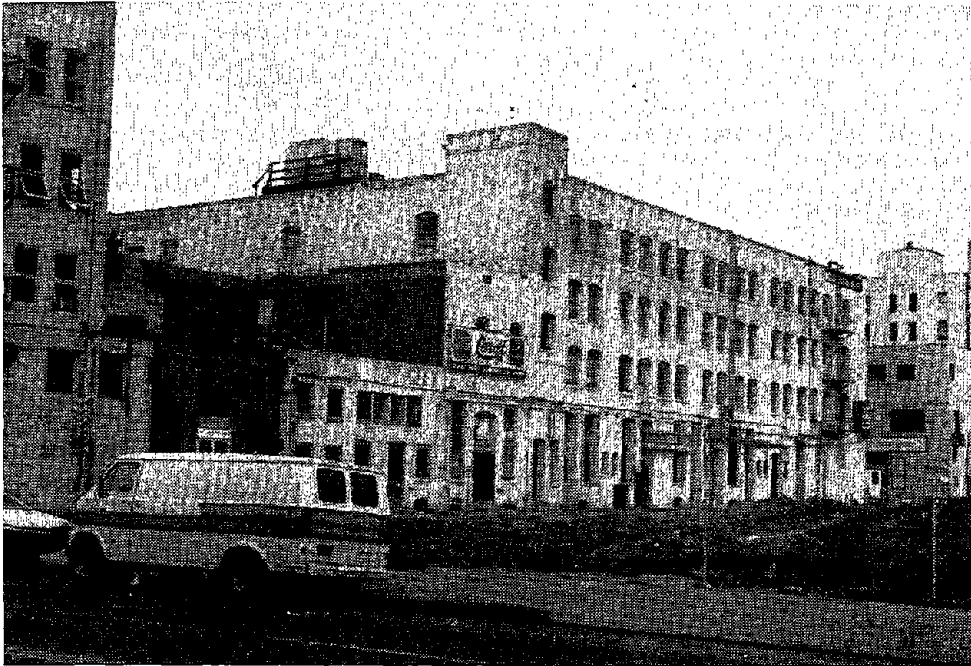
REAR WALL OF COMMERCIAL BUILDINGS,
